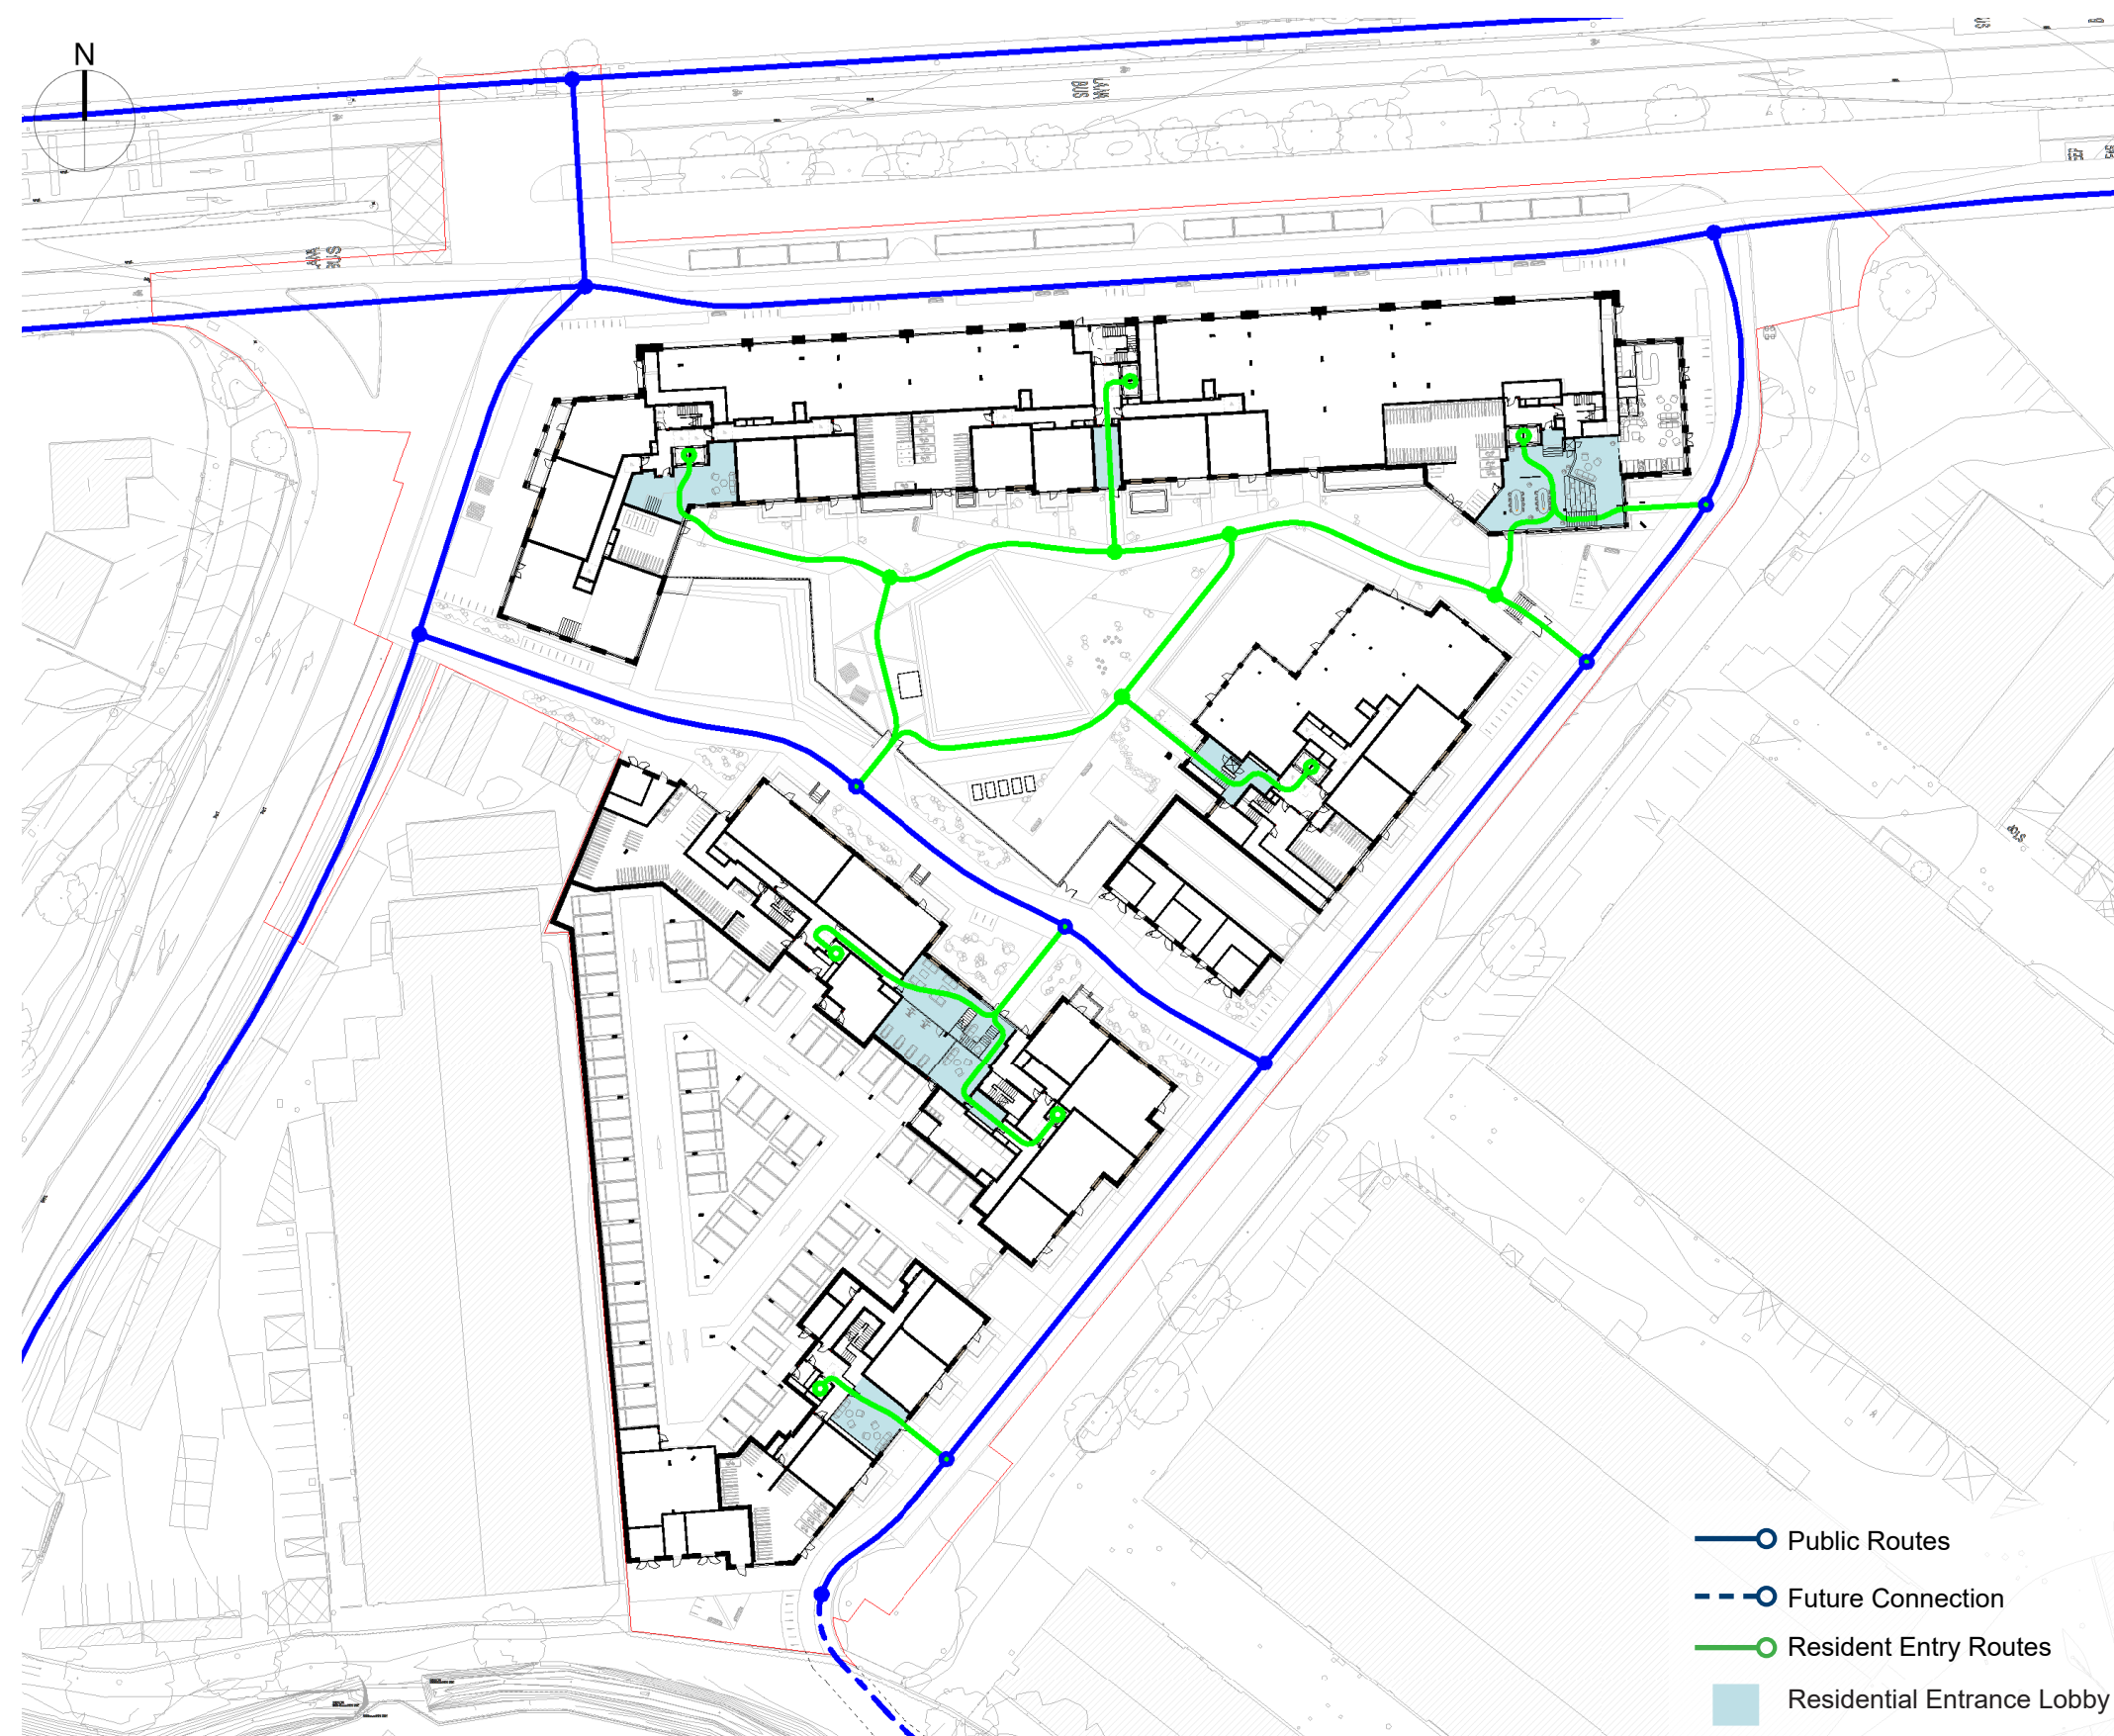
Ground Floor showing Resident Access Points to Apartment Buildings
